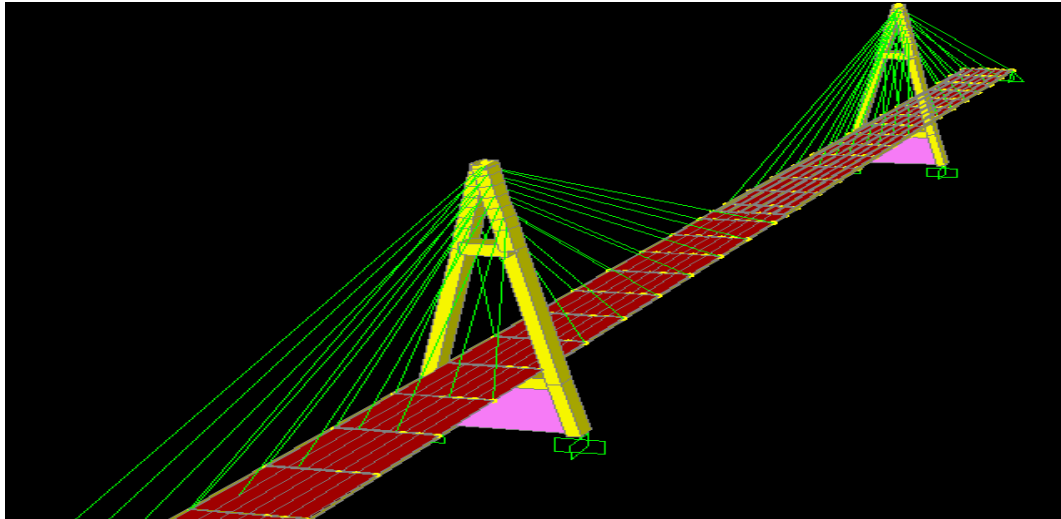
Extrude 3D view of the bridge with A-shape pylon
